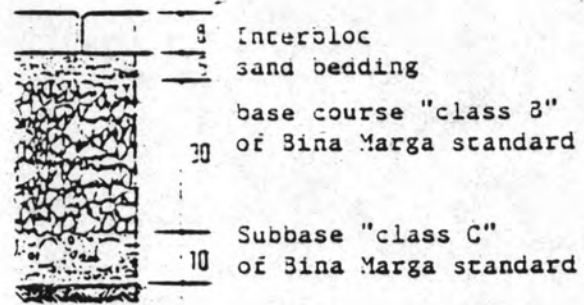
Pavement structure between stations 0+302 and 0+352
